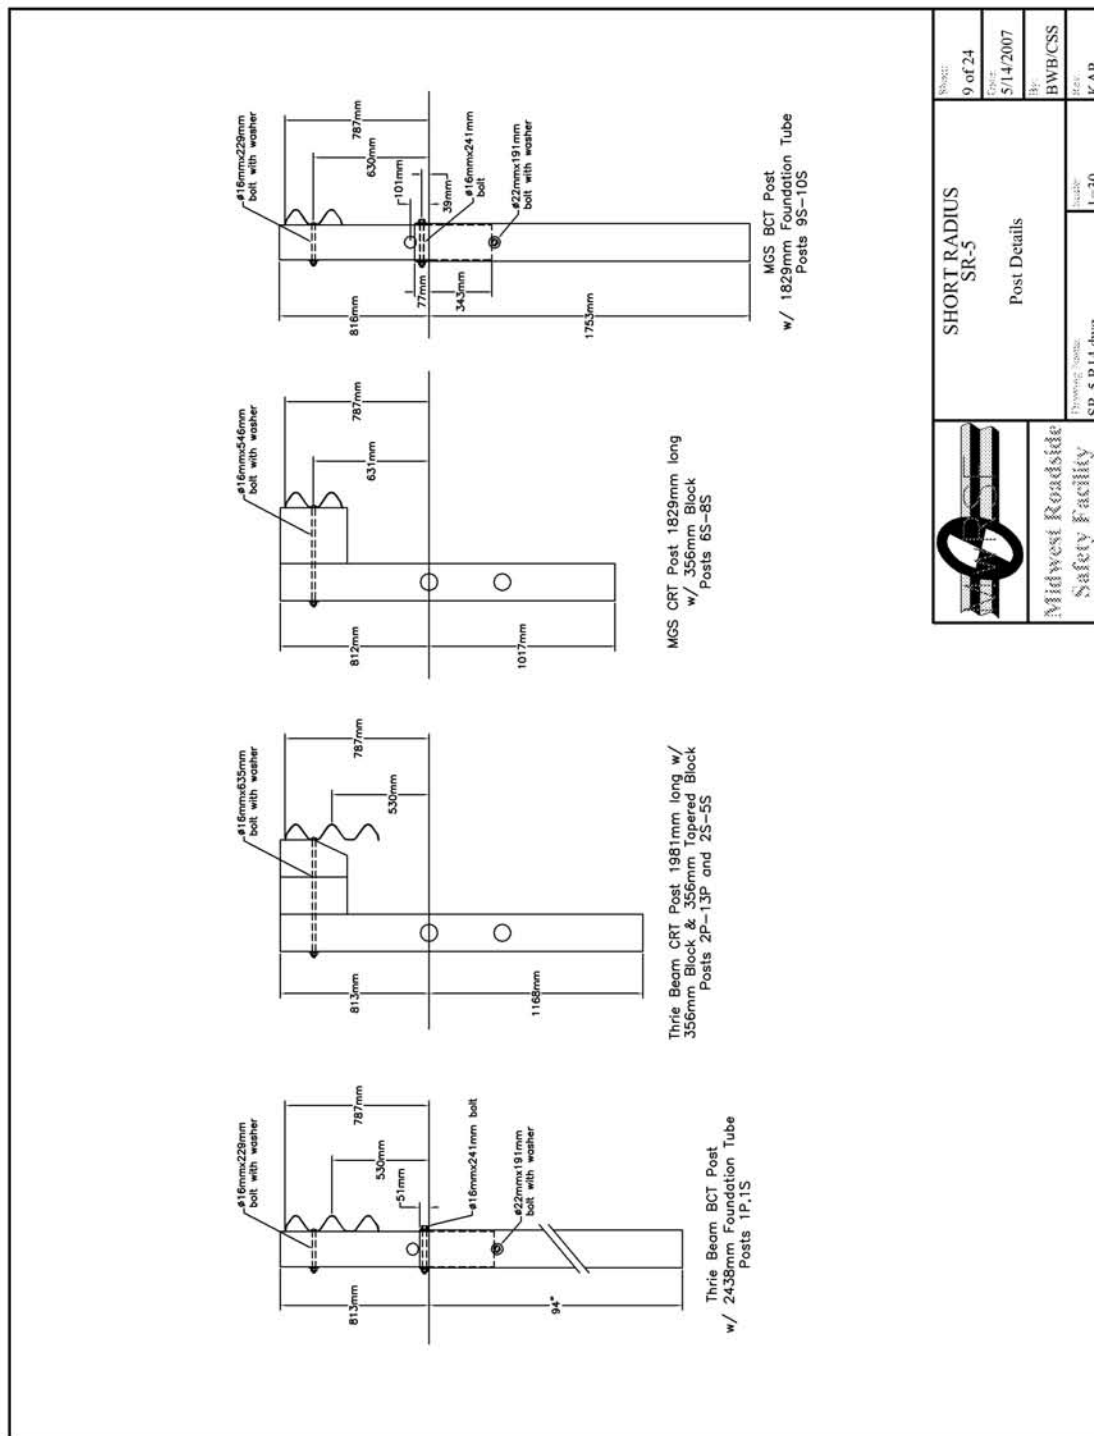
MGS Timber Posts and Foundation Tube and Thrie Beam Foundation Tube Details
